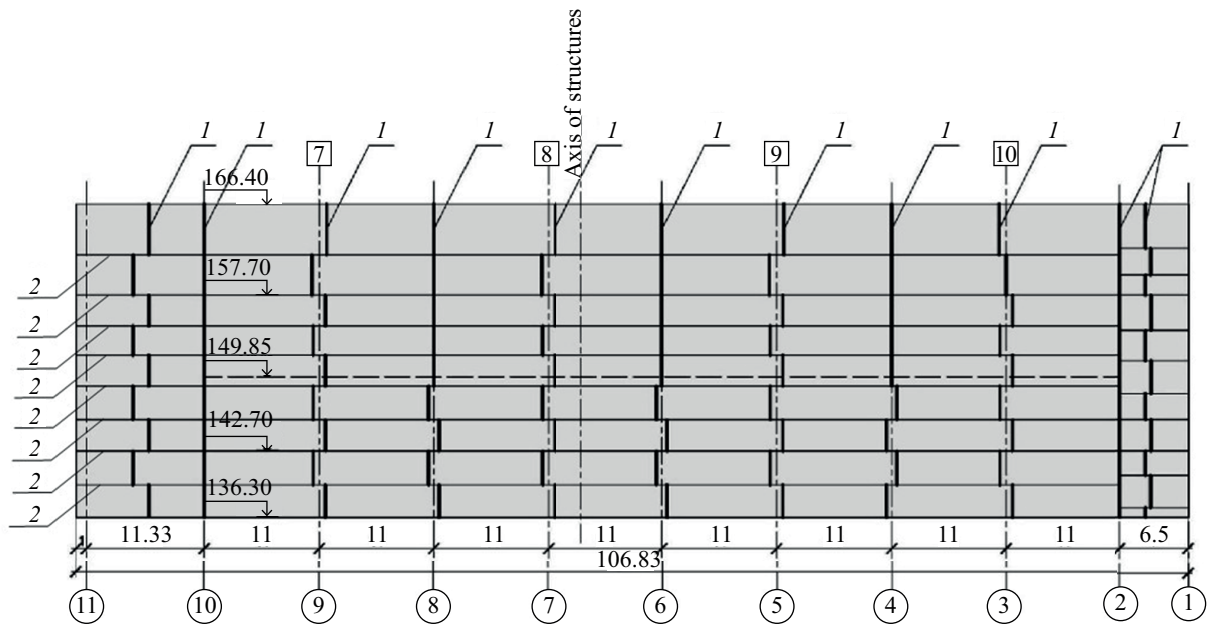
Vertical (1) and horizontal (2) construction joints in the diaphragm wall of the head building of the PSPP
